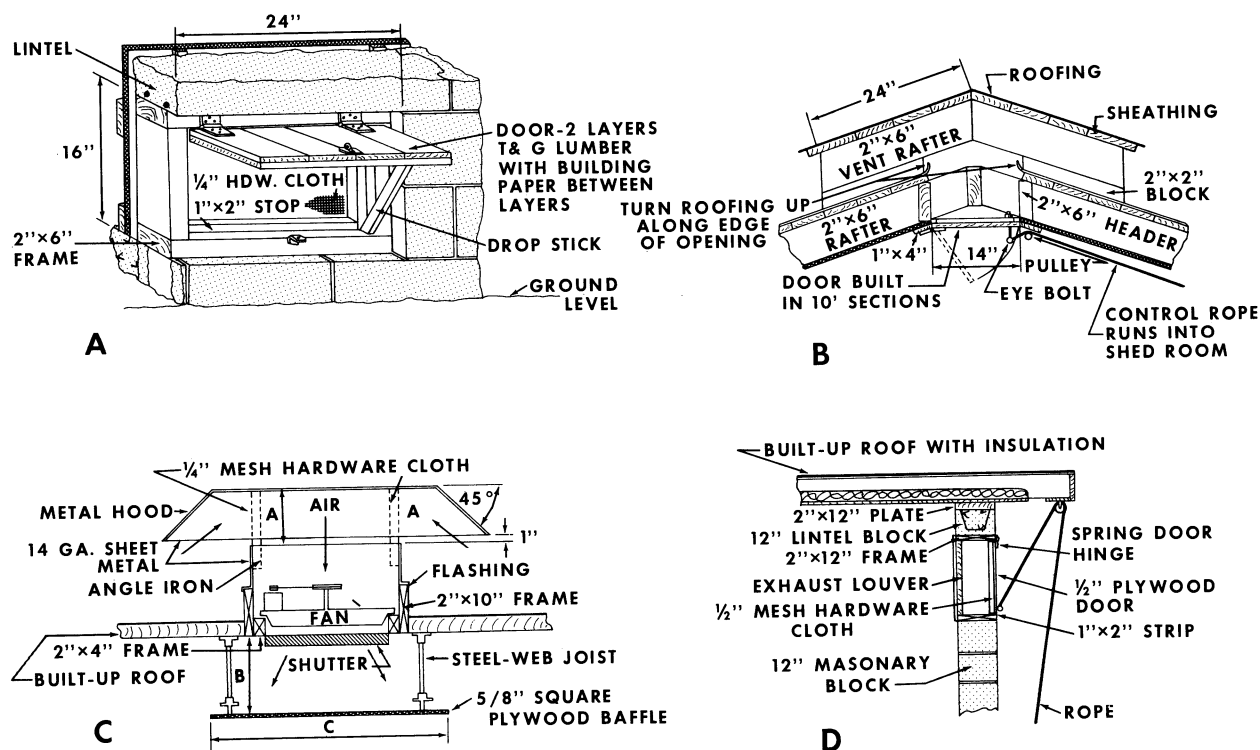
Suggested construction details for ventilating systems: *A*, Air-intake vent at or below floor level for convection-type ventilation; *B*, ridge-exhaust vent for convection-type ventilation; *C* hood and baffle for intake blower mounted in roof of storage room; *D*, exhaust louver for overhead ventilation.
